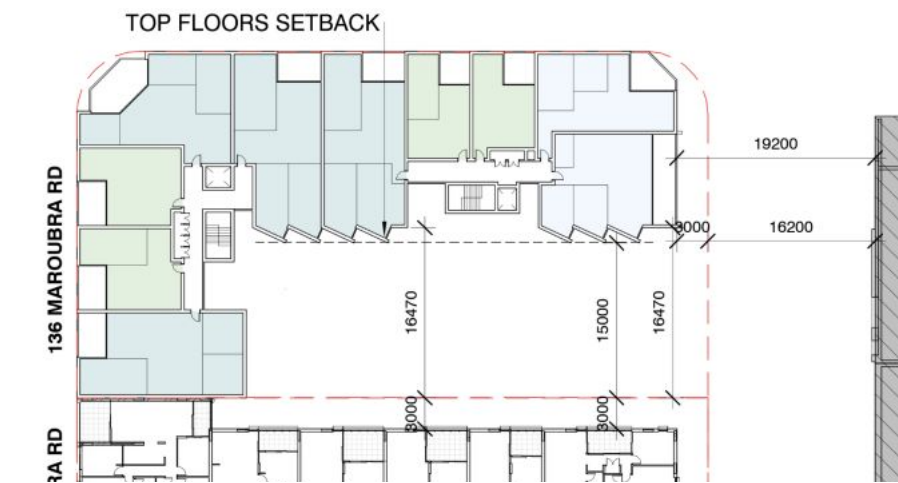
STUDY OF TYPICAL FLOOR PLATE OF POLICE STATION SITE (DRJD)
